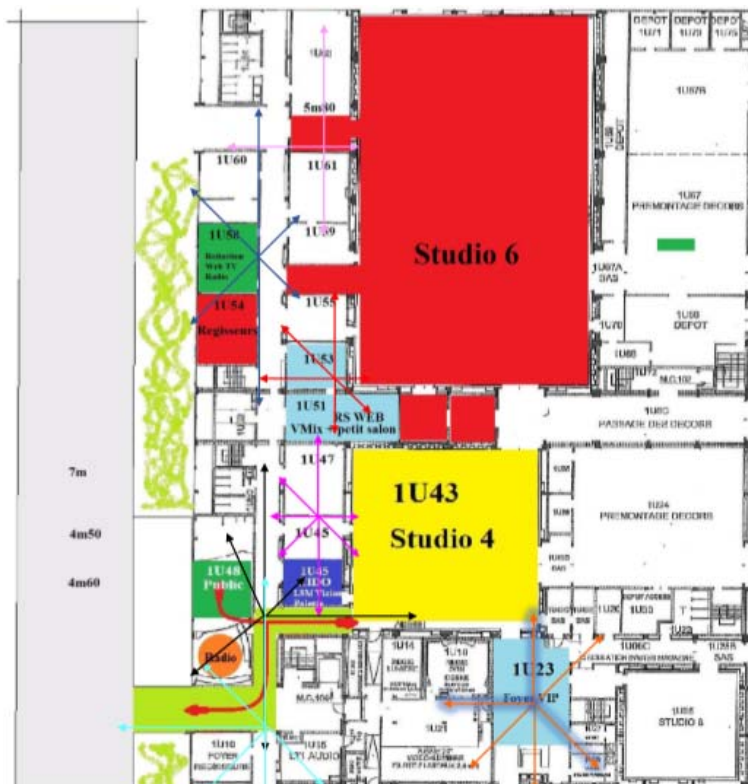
Design at 5 GHz for Floor 1 Television Studios in Building CHJM
